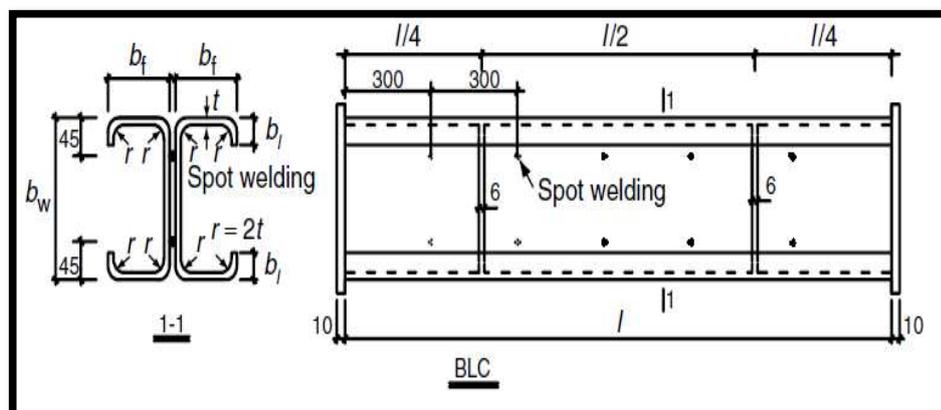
Cross-sections of the tested beams by Zhou and Shi (2011).^[9]
